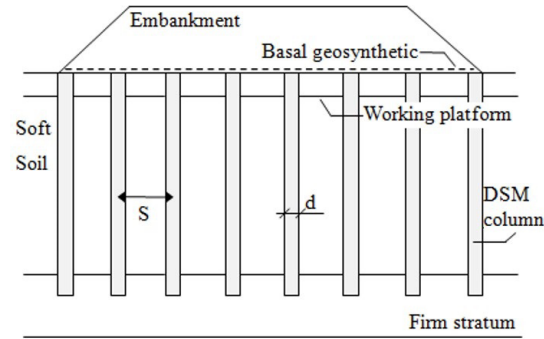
Typical use of *DSM* columns with diameter d for piled embankment on soft soils, piles spaced s center to center.
